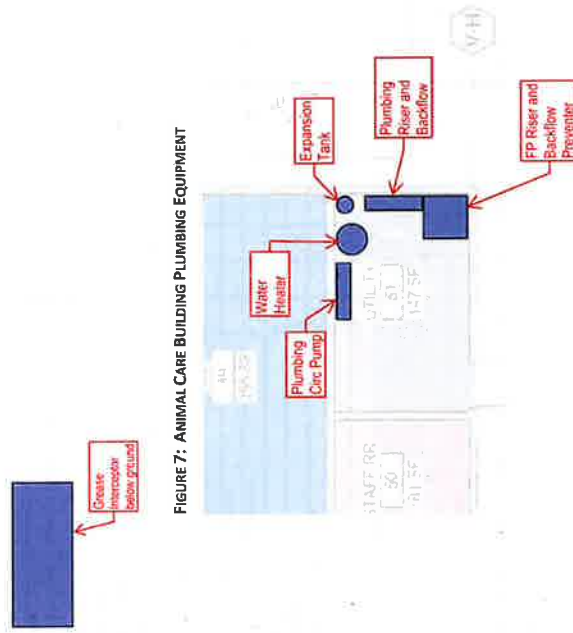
ANIMAL CARE BUILDING PLUMBING EQUIPMENT
